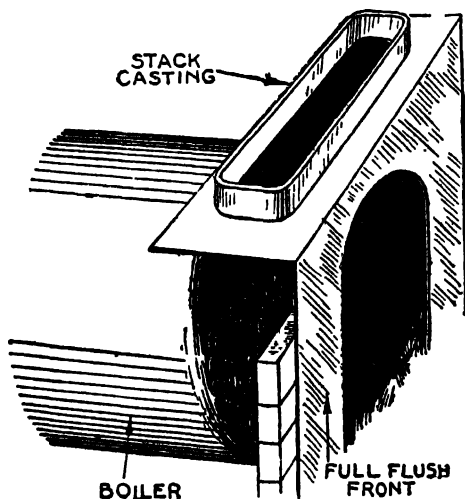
,408.—Stack plate casting for flush end boiler, full flush front. The smoke box is formed by the brickwork of the setting.
